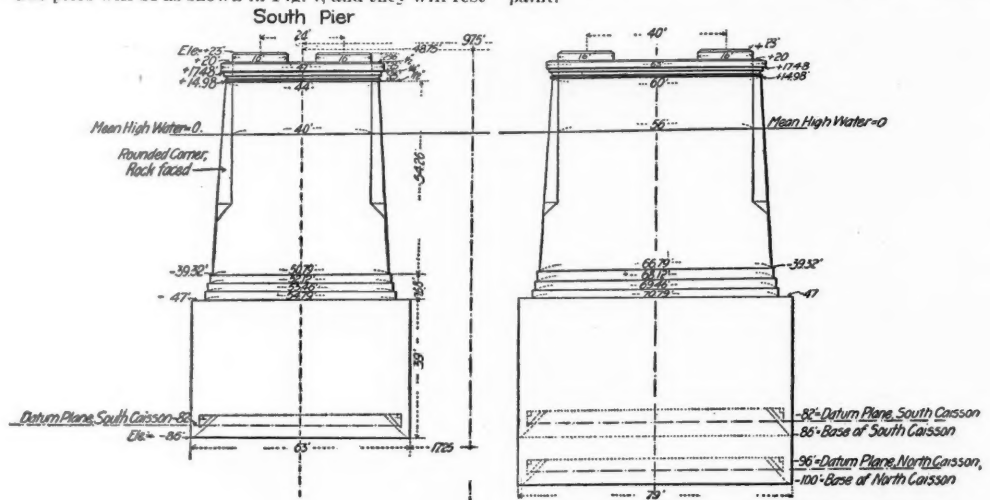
Plan and Elevations of Tower Foundations for New East River Bridge.
